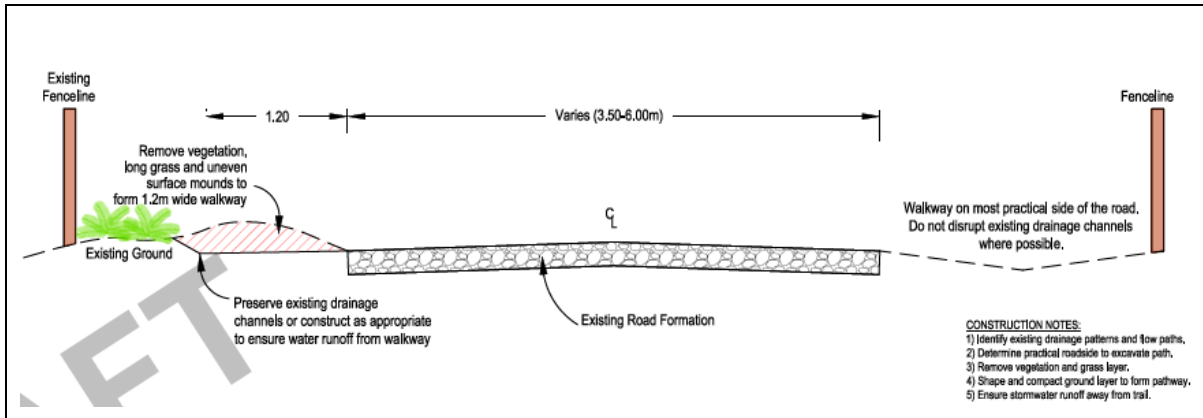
Typical Trail Cross-section 10: Walkway alongside low-volume road
